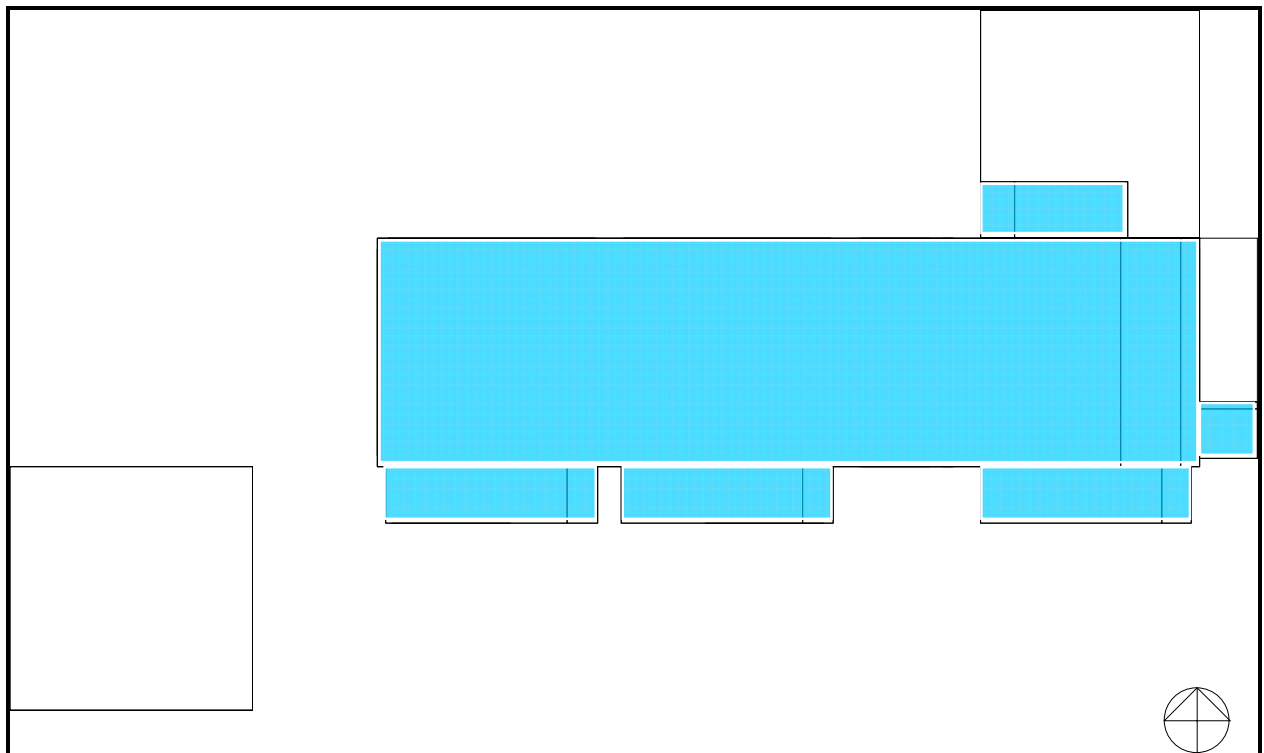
Conditioned area plan. Blue spaces are conditioned space.
